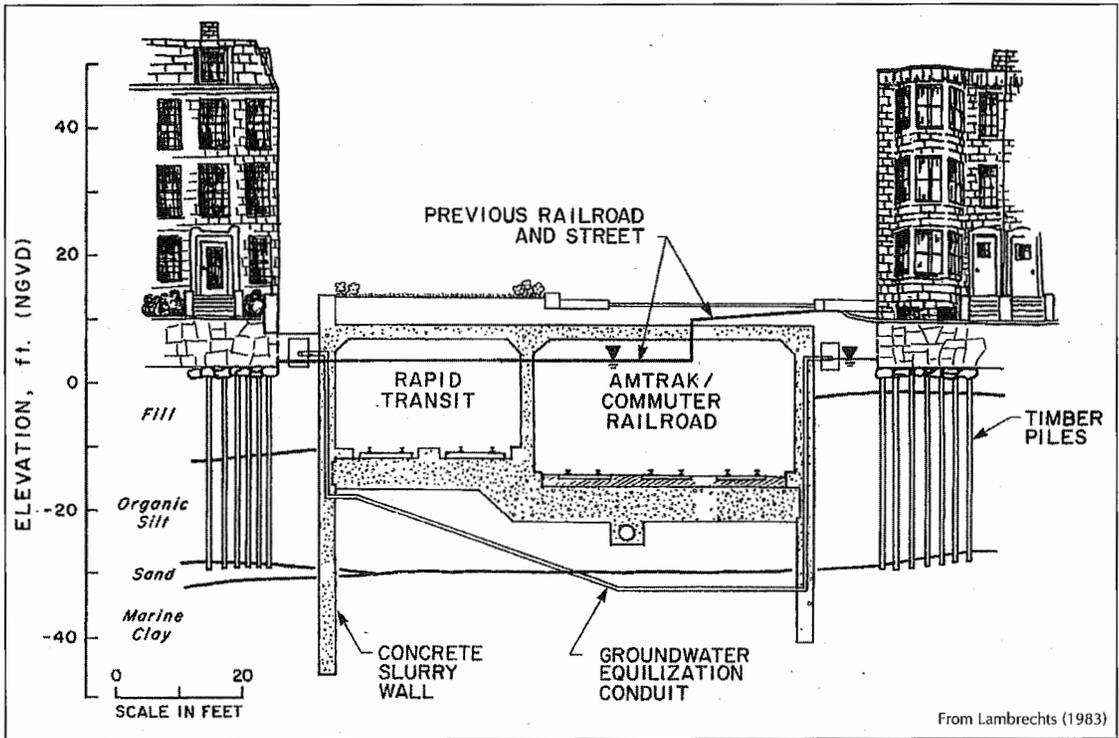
Typical section of the Southwest Corridor Project of the Orange Line through the Back Bay.
